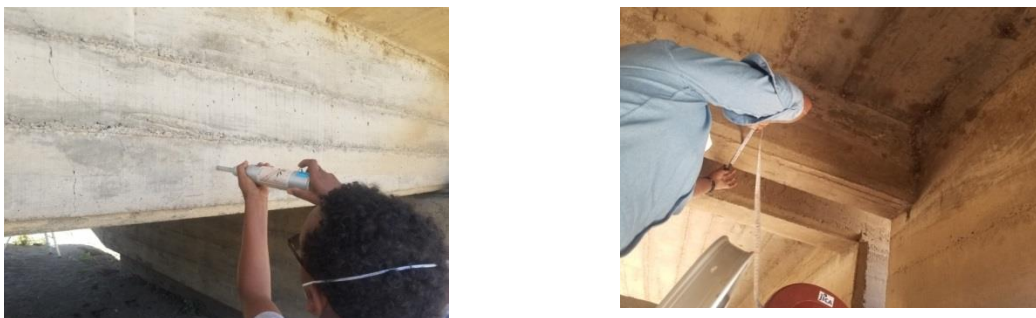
4: Measuring the size of crack openings with crack scale
